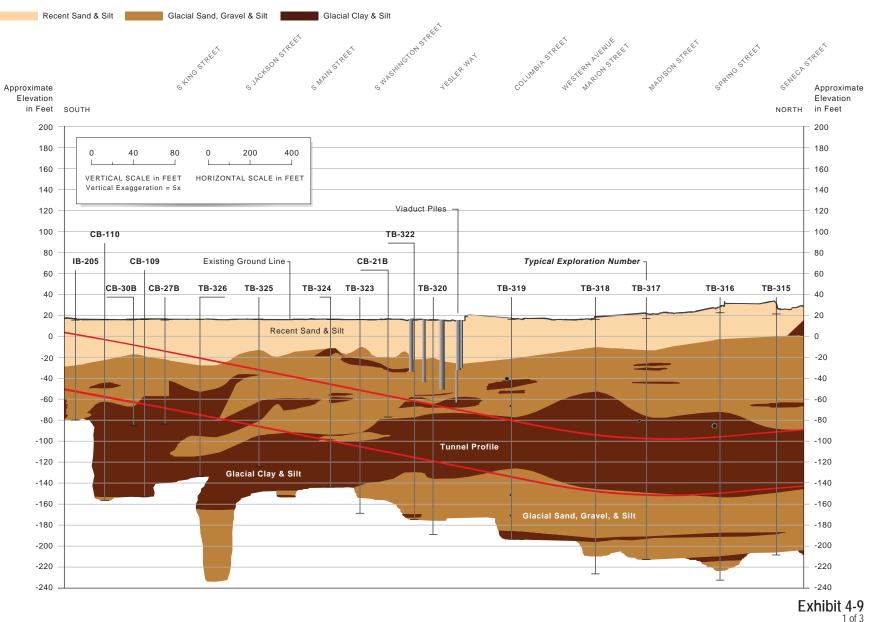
shows a generalized subsurface profile along the bored tunnel alignment. This exhibit depicts the three soil groups described in Section 4.3.1: Recent Sand and Silt; Glacial Clay and Silt; and Glacial Sand, Gravel and Silt.
